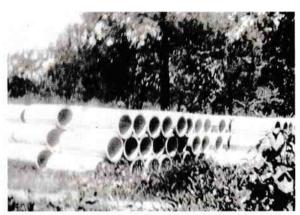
Pipes at the Ollera Creek pipeworks stacked ready to go to the construction site, Mt Spec Road in1932.
